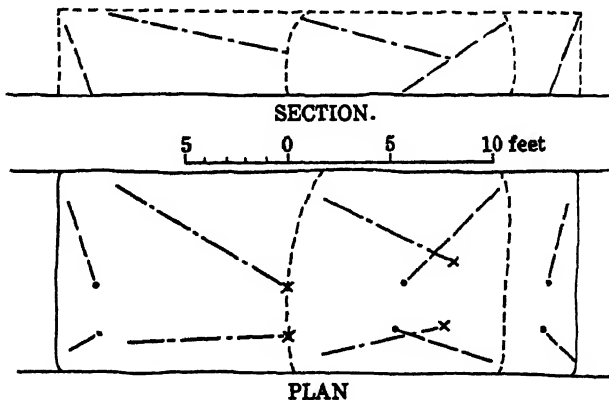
UPSET SHOWING ARRANGEMENT OF HOLES.
